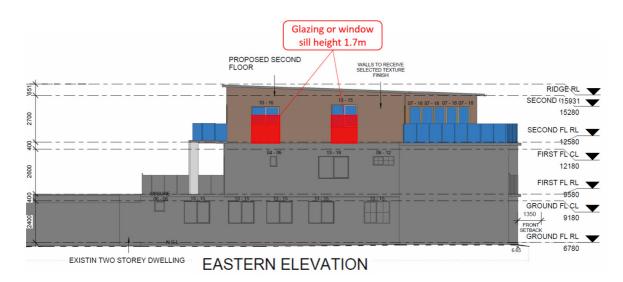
Adapted Eastern Elevations illustarting windows required to have 1.7m high obscure glazing
